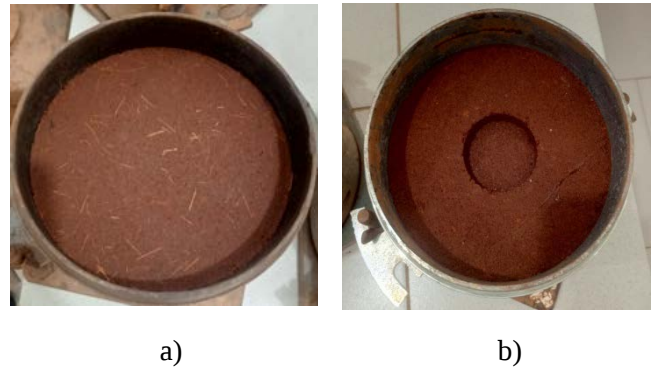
CBR test, a) Test specimen after immersion, b) Test specimen after punching
